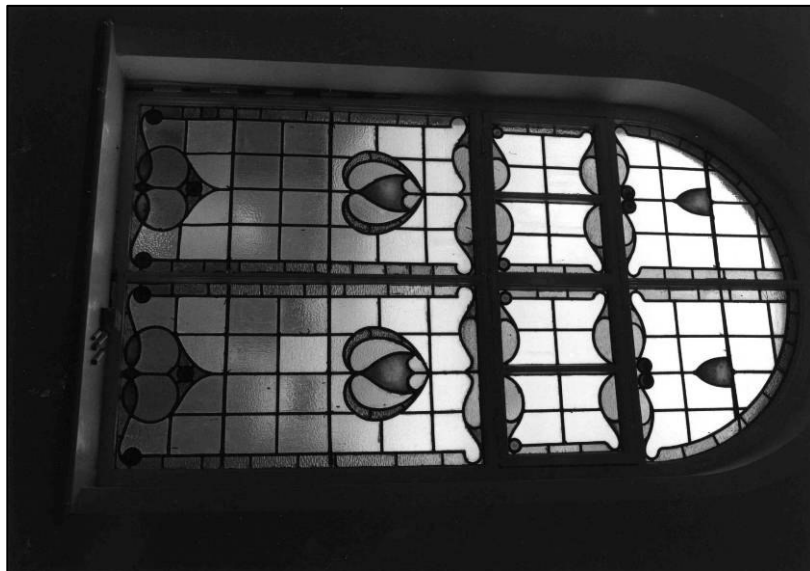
School: 1F, typical window to former gallery area, looking E (photo 13/3) (top to right).
